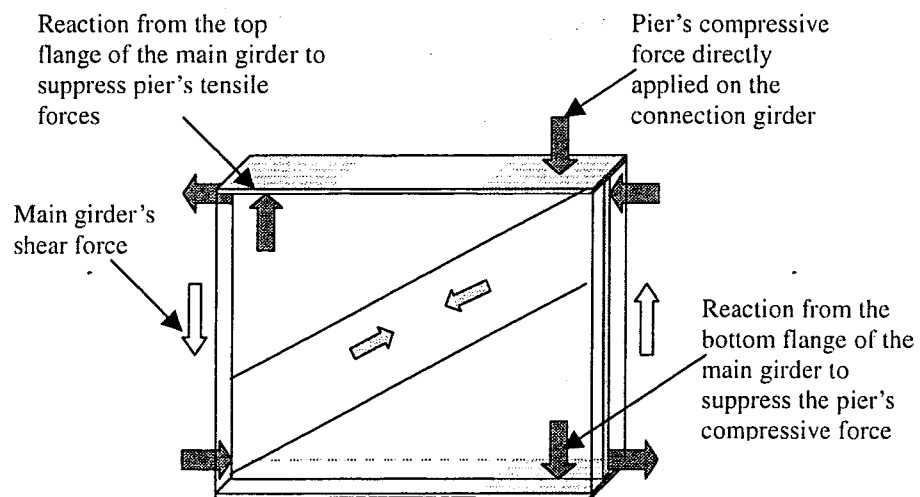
Force transfer mechanism in portion of main girder inside connection (C-1)
